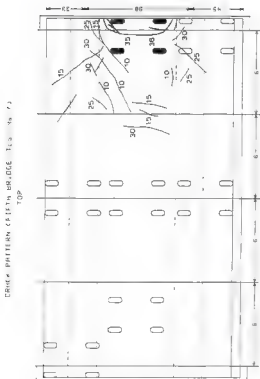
Top Cracking Pattern (Fifth Bridge - Test No 7)
